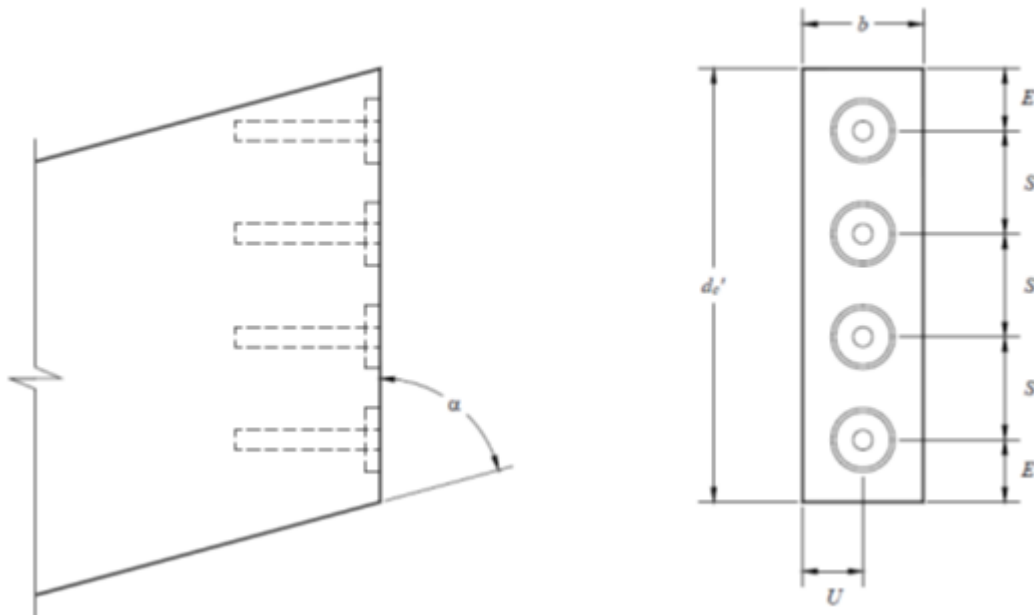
Summary of peak connection dimensions for typical shear plate connection (AWC, 2013)
